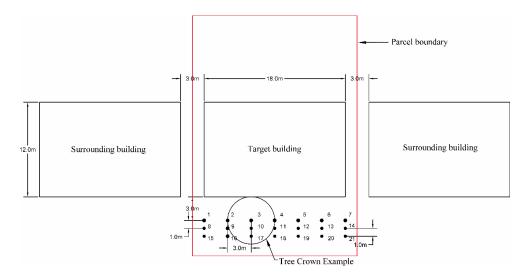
Potential Tree Locations in the Study Site (Plan View)
